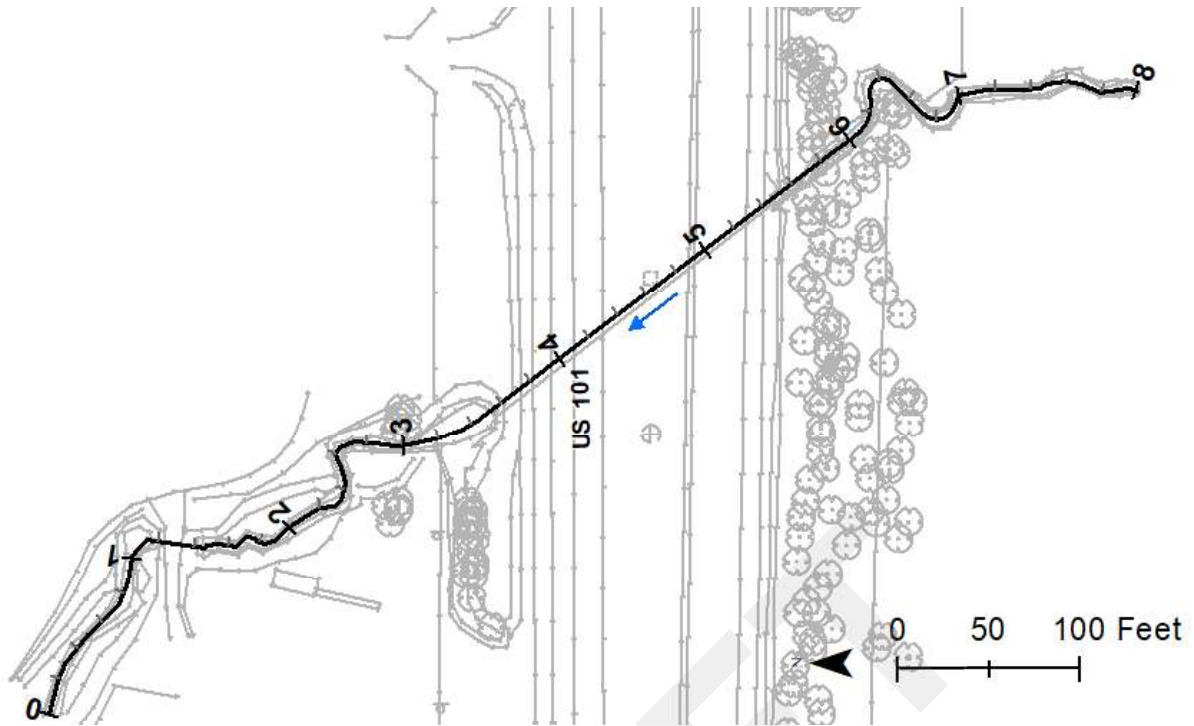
Longitudinal profile stationing for existing and proposed conditions
